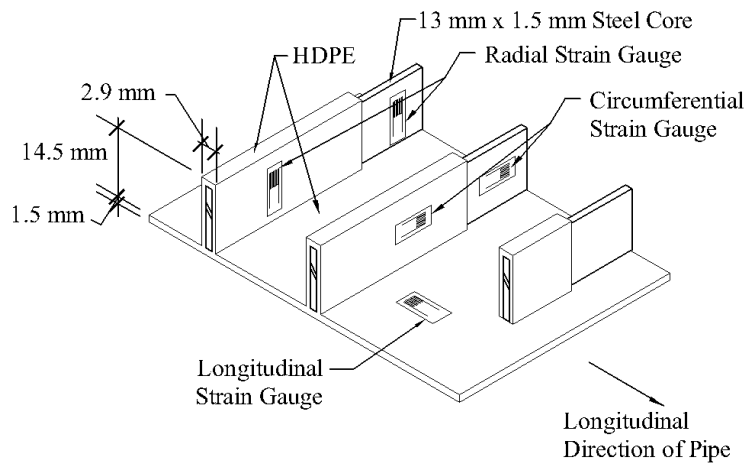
Pipe Wall Section and Strain Gauge Orientation
